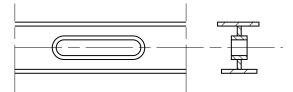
Stiffening of large openings in primary supporting members - Solution 2
